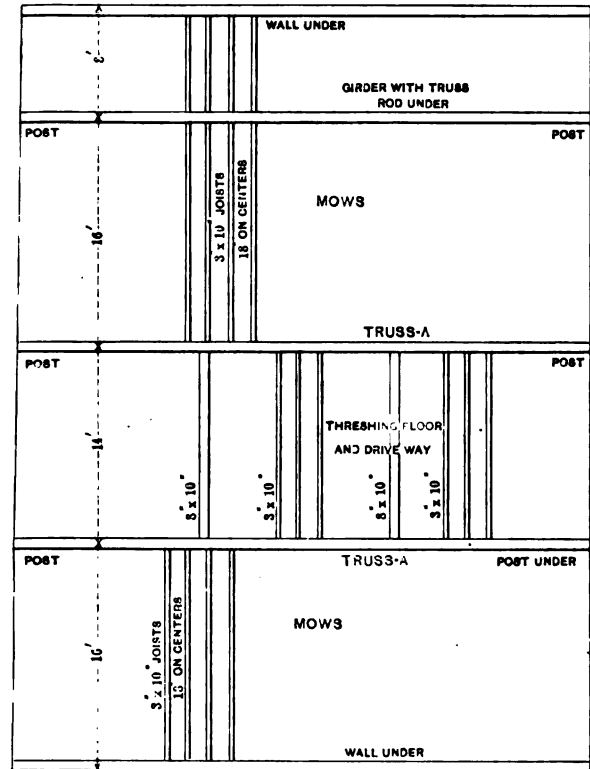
Plan of Main Floor of Barn, Showing Position of the Several Trusses.
